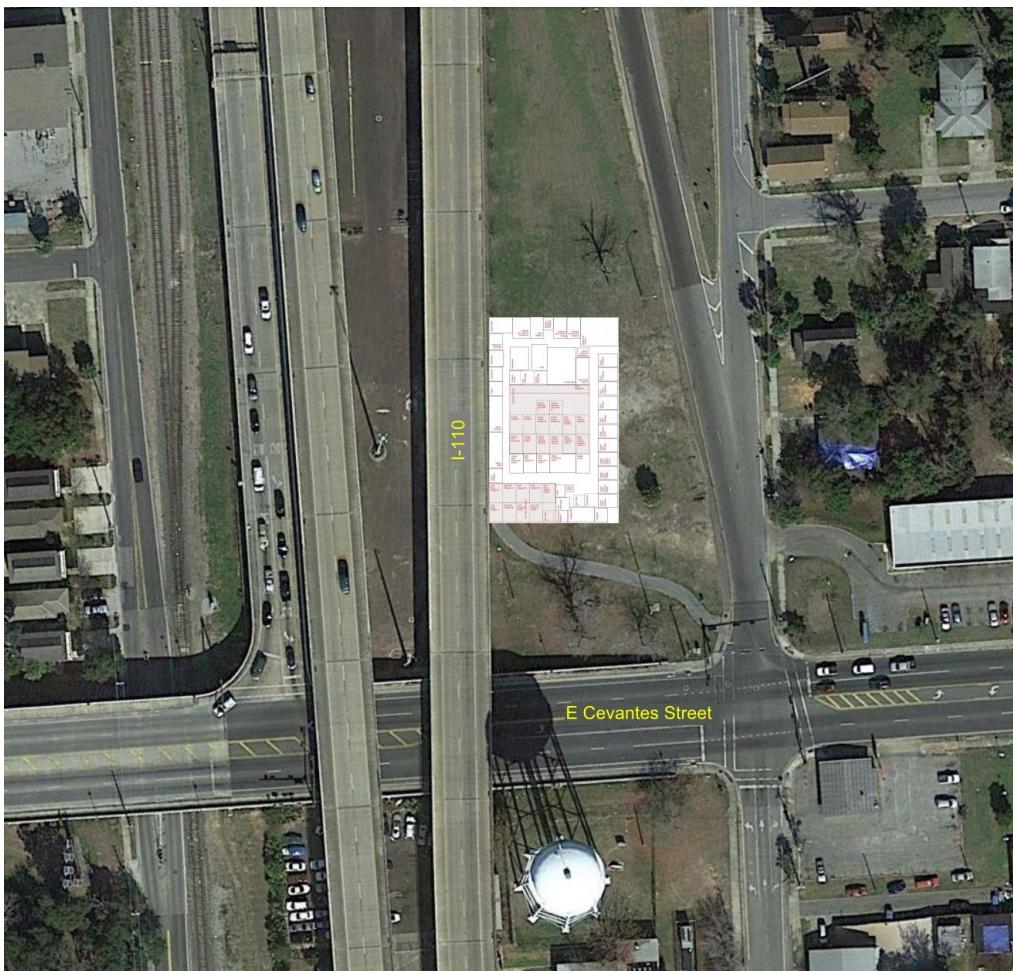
Conceptual Floor Plan on Site at I-110 and E. Cervantes Street
